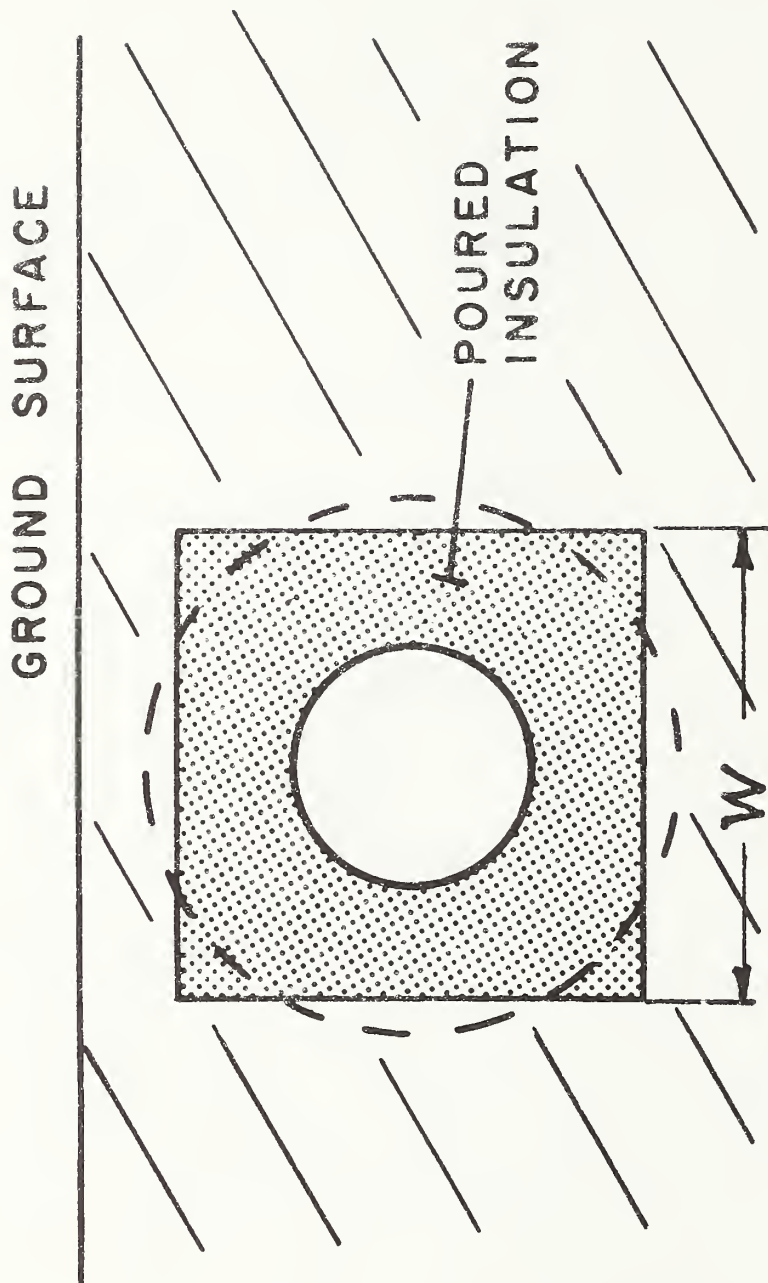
UNDERGROUND PIPE IN AN INSULATED TRENCH
